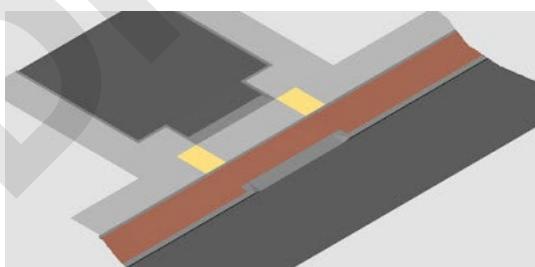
Side Road Entry Treatment (Ranty Highwayman)
